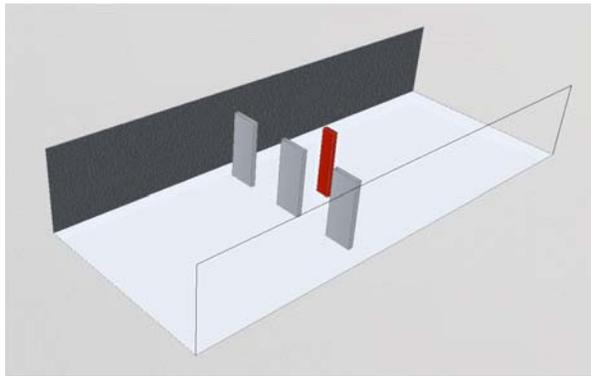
Perforated and solid wall configurations (Center segment instrumented).
